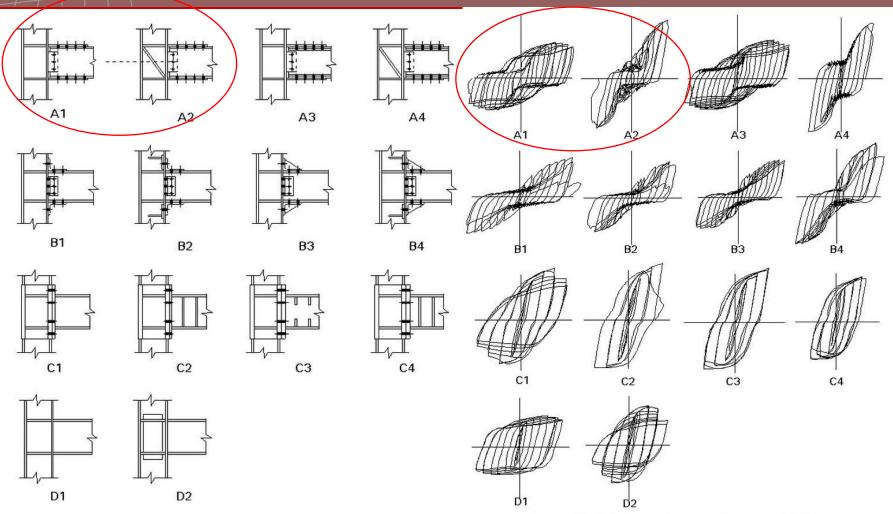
Types of beam-to-column connections tested by Ballio, Mazzolani et al.
